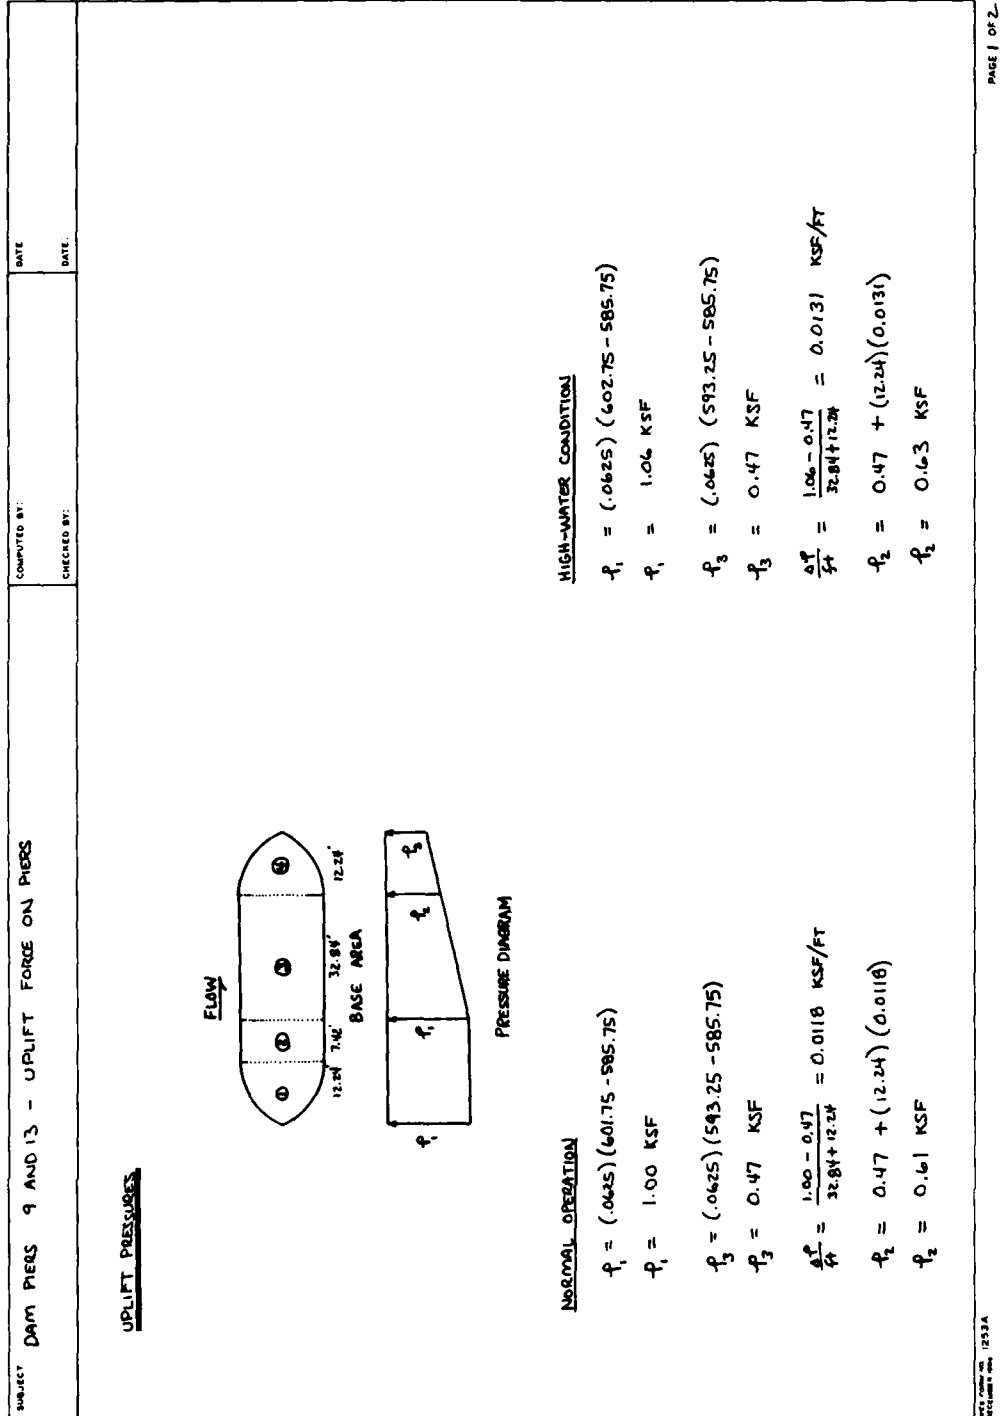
Uplift force on piers, dam piers 9 and 13, Soo Dam (Continued)
